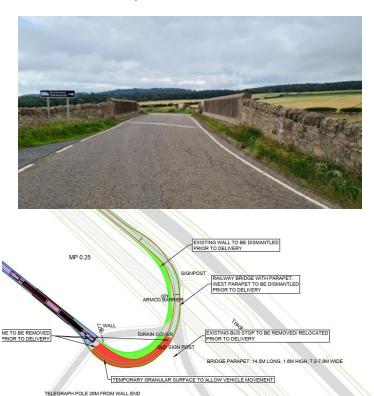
Railway bridge Crossing for Delivery to Substation Location 3
